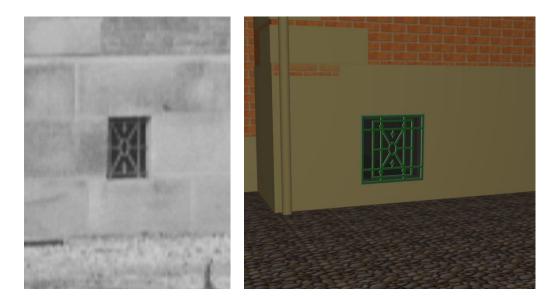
CHEH Original 1877 sub-floor vent grille (left) and proposed replica vent to be reinstated in the same position (right). (Colours/materials in the proposed are not indicative of reality). Note that the proportion of the proposed vent has changed to accommodate the dimensions of the mechanical ventilation assembly (no adequate system could be developed that fitting within the width of the original vent opening). Note also that the ground level of the building been filled considerably since its original construction, as the proposed vent is located in the same stone course as the original, though it appears lower to the ground.
